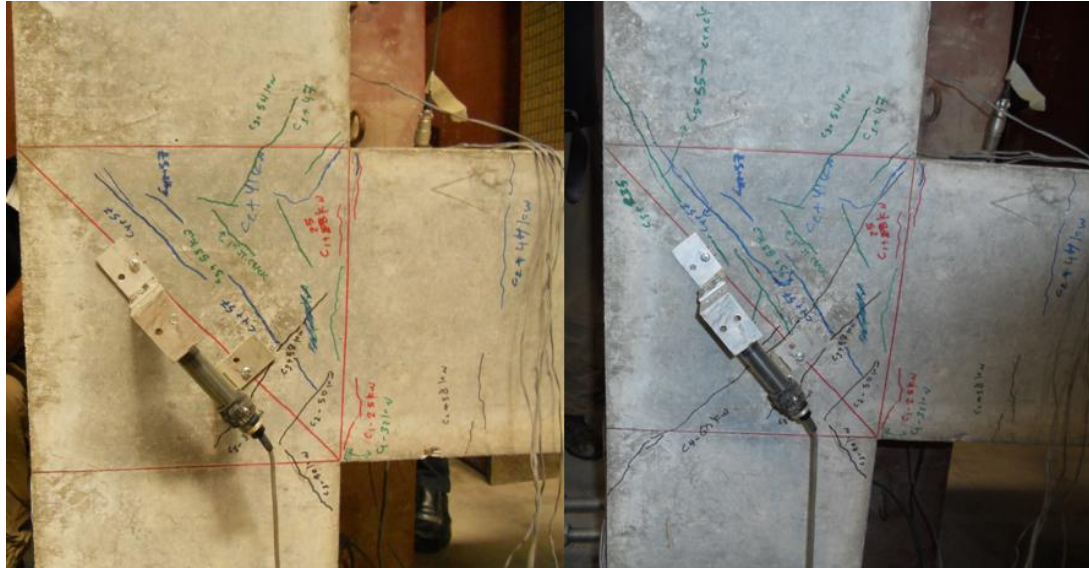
Widening Up of Shear Diagonal Crack in Joint for Specimen J-BU-12
